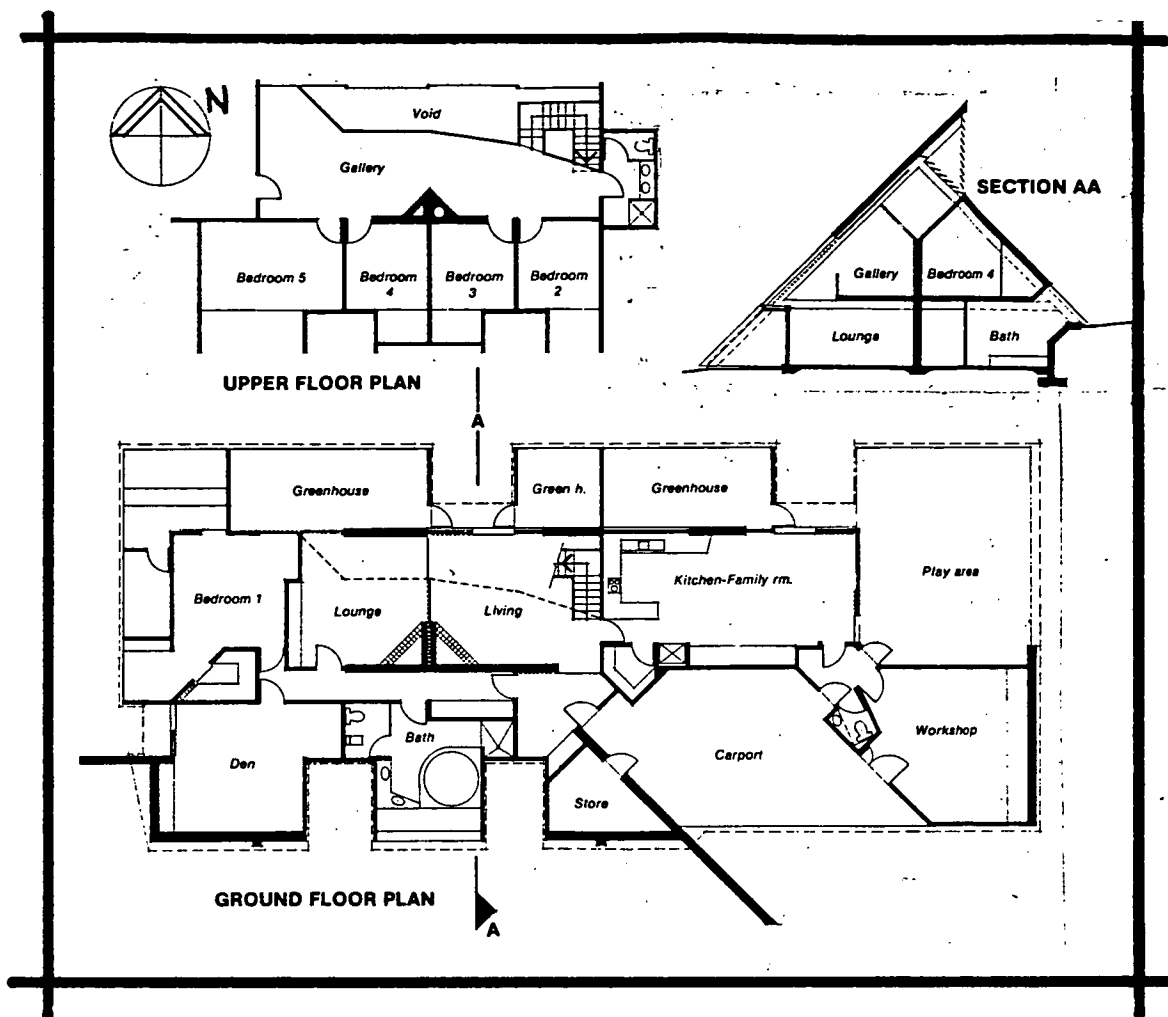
Floorplan and section drawing of the Pickup House, Launceston.
